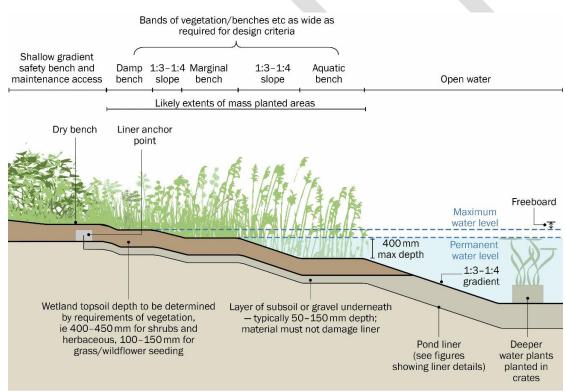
Typical Planted Pond Edge Detail. Source: The SuDS Manual C753
